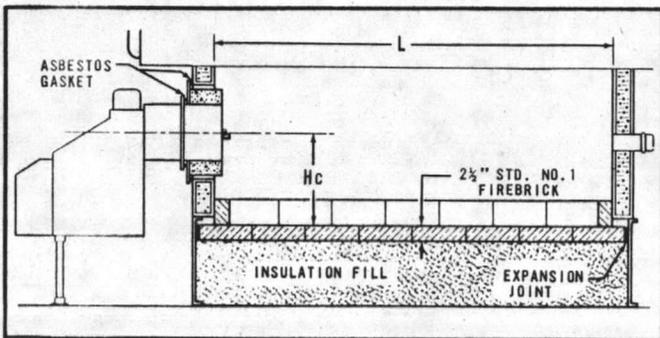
TYPE "S" BURNER INSTALLATION FIRING FIREBOX BOILER THROUGH THE DOOR
